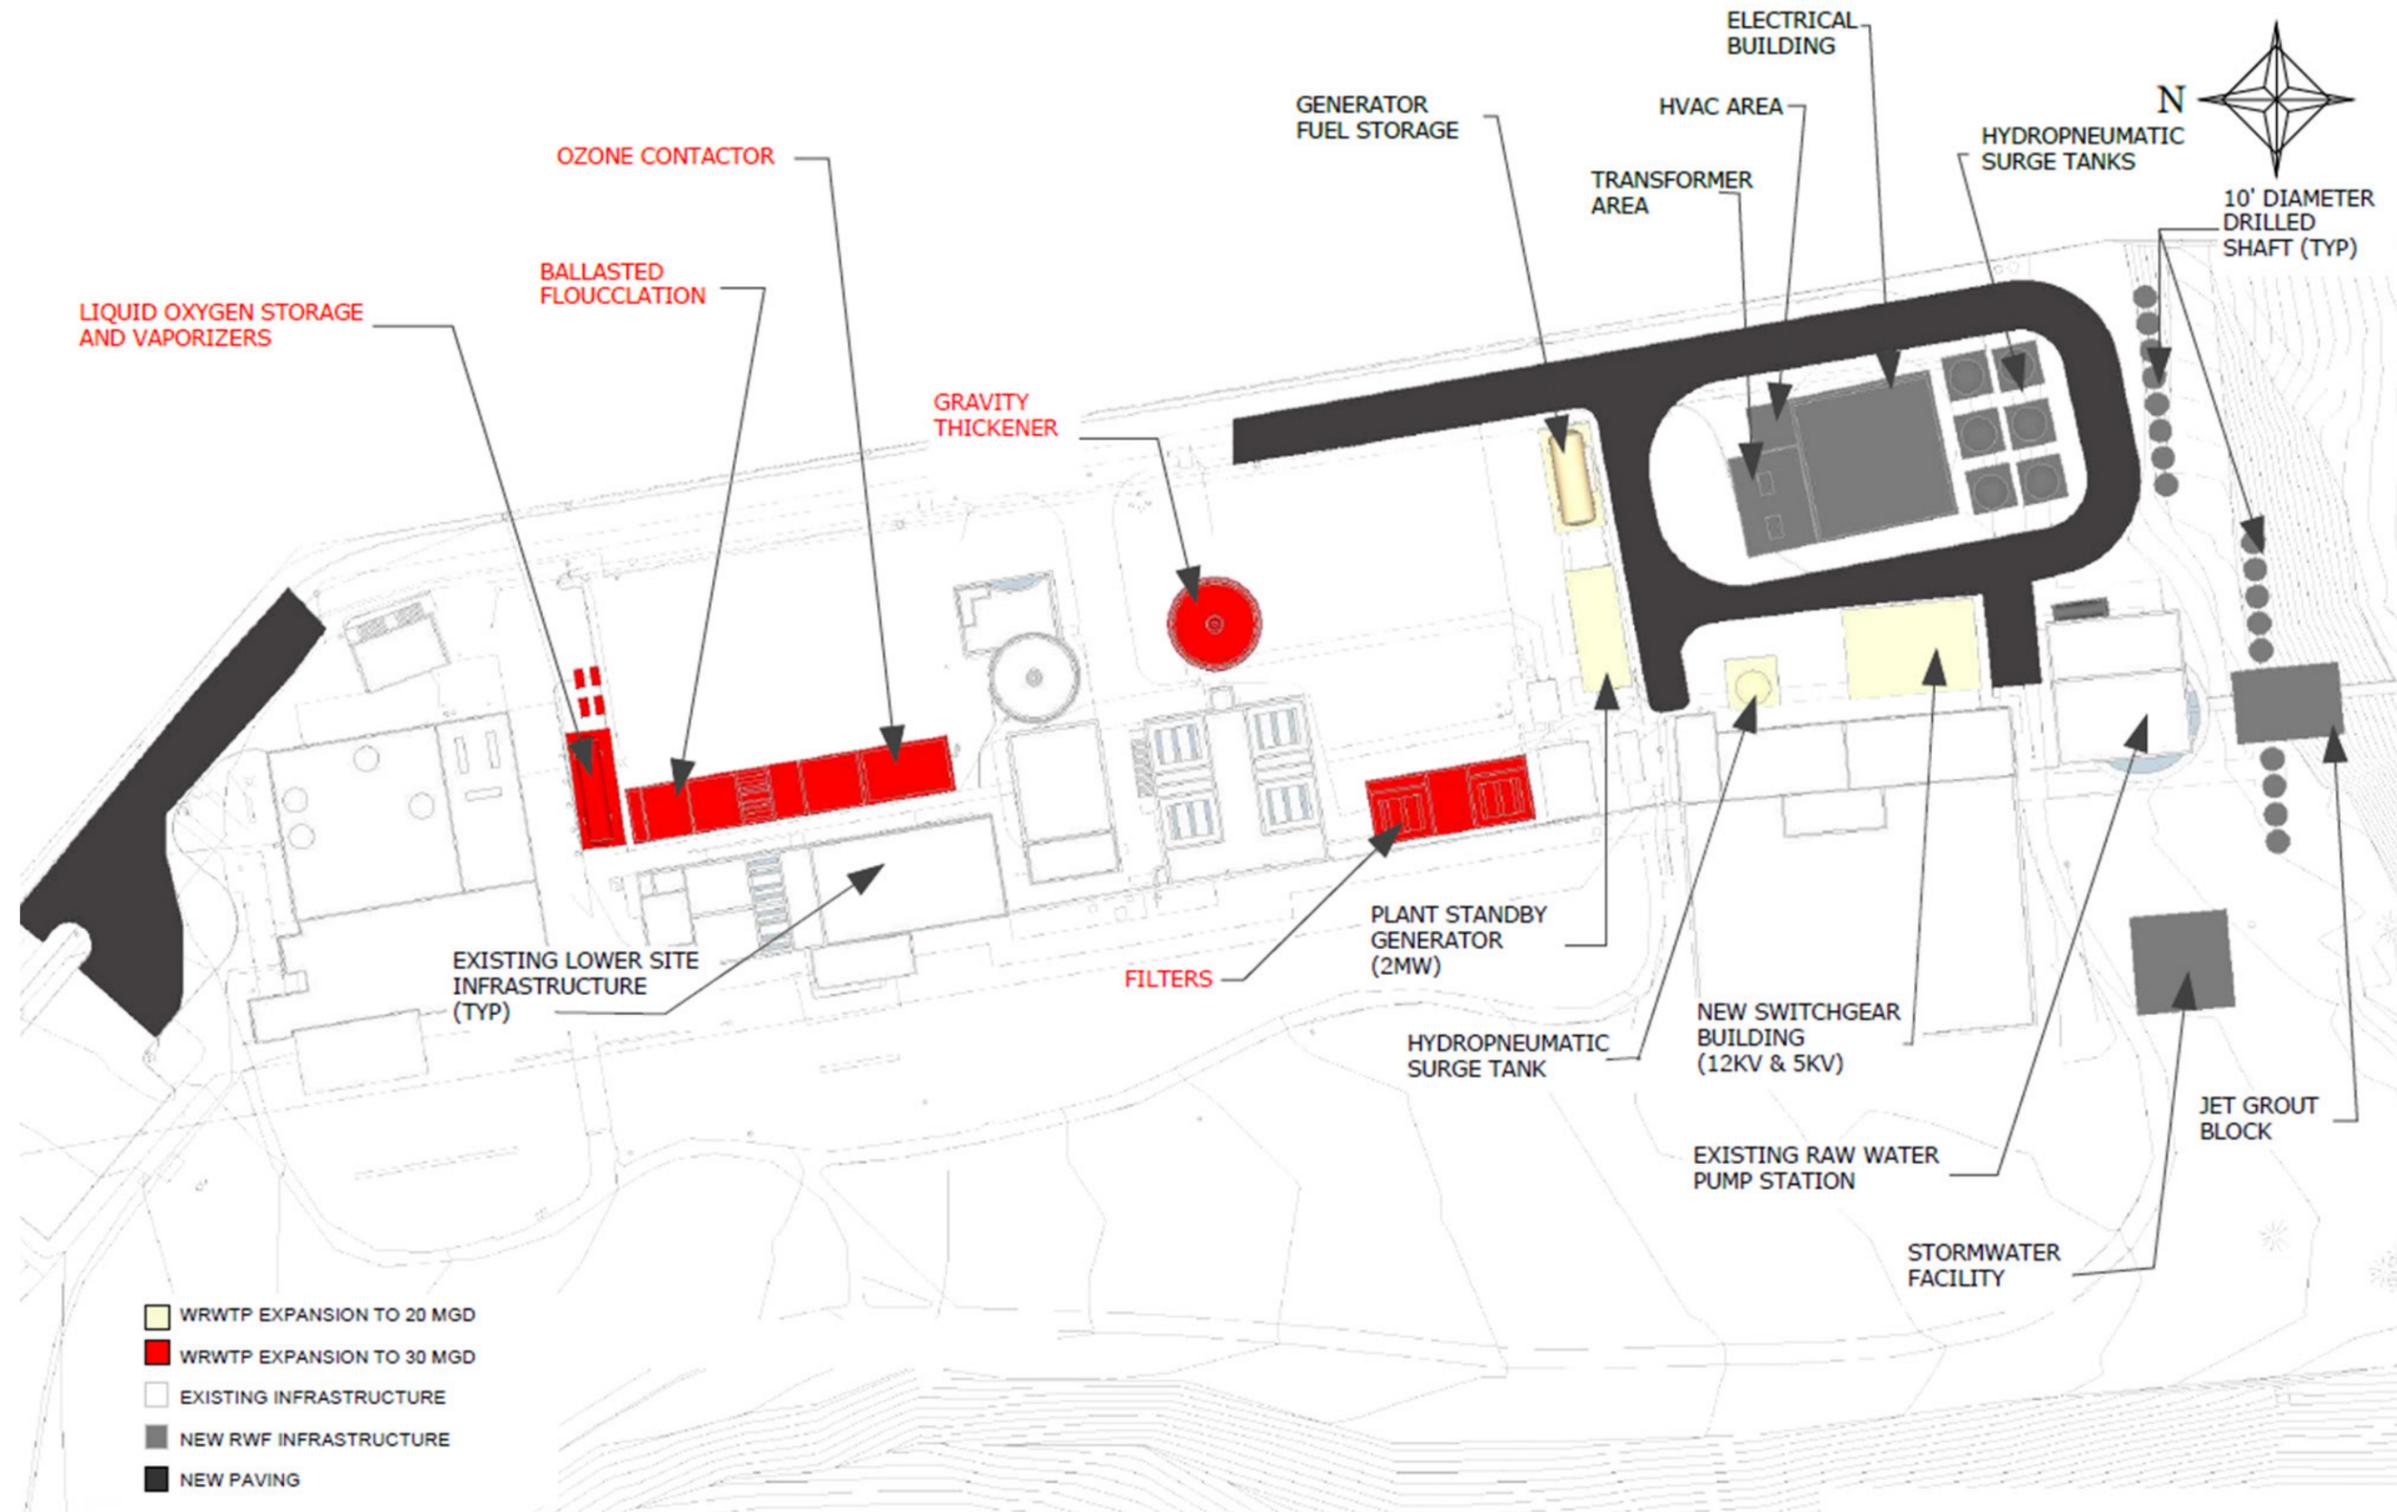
Site Plan – 30-MGD Capacity Expansion
